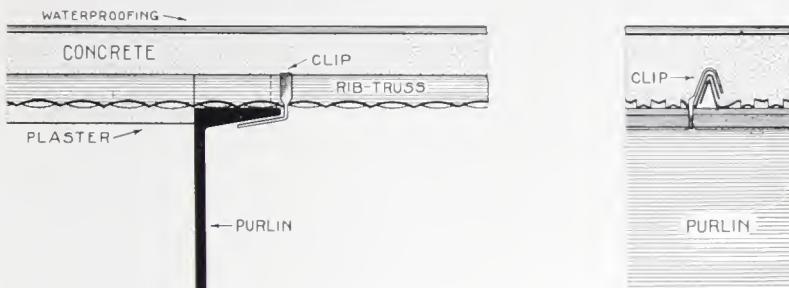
RIB-TRUS Fastened to Purlin by Special Clip. Plastered Underneath and Concreted and Waterproofed Above
